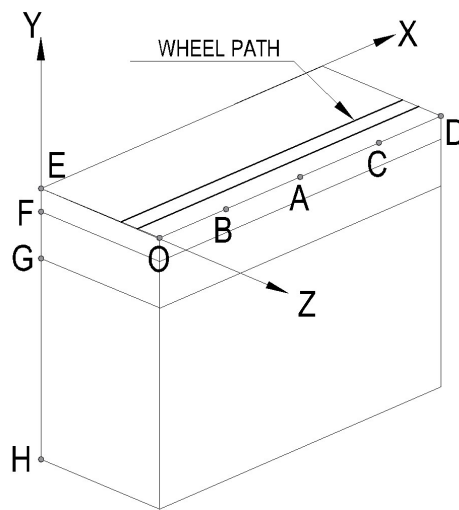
A typical section of flexible pavement with pavement layers of asphalt-EF, base-FG and subgrade-GH.
